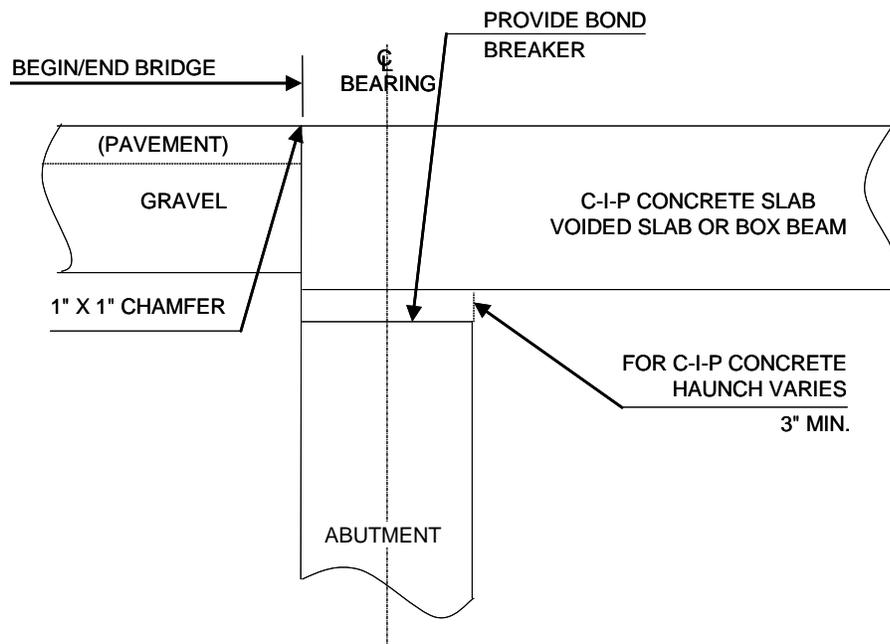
1 Type D - Bridge Ends for short spans without Approach Slabs.
